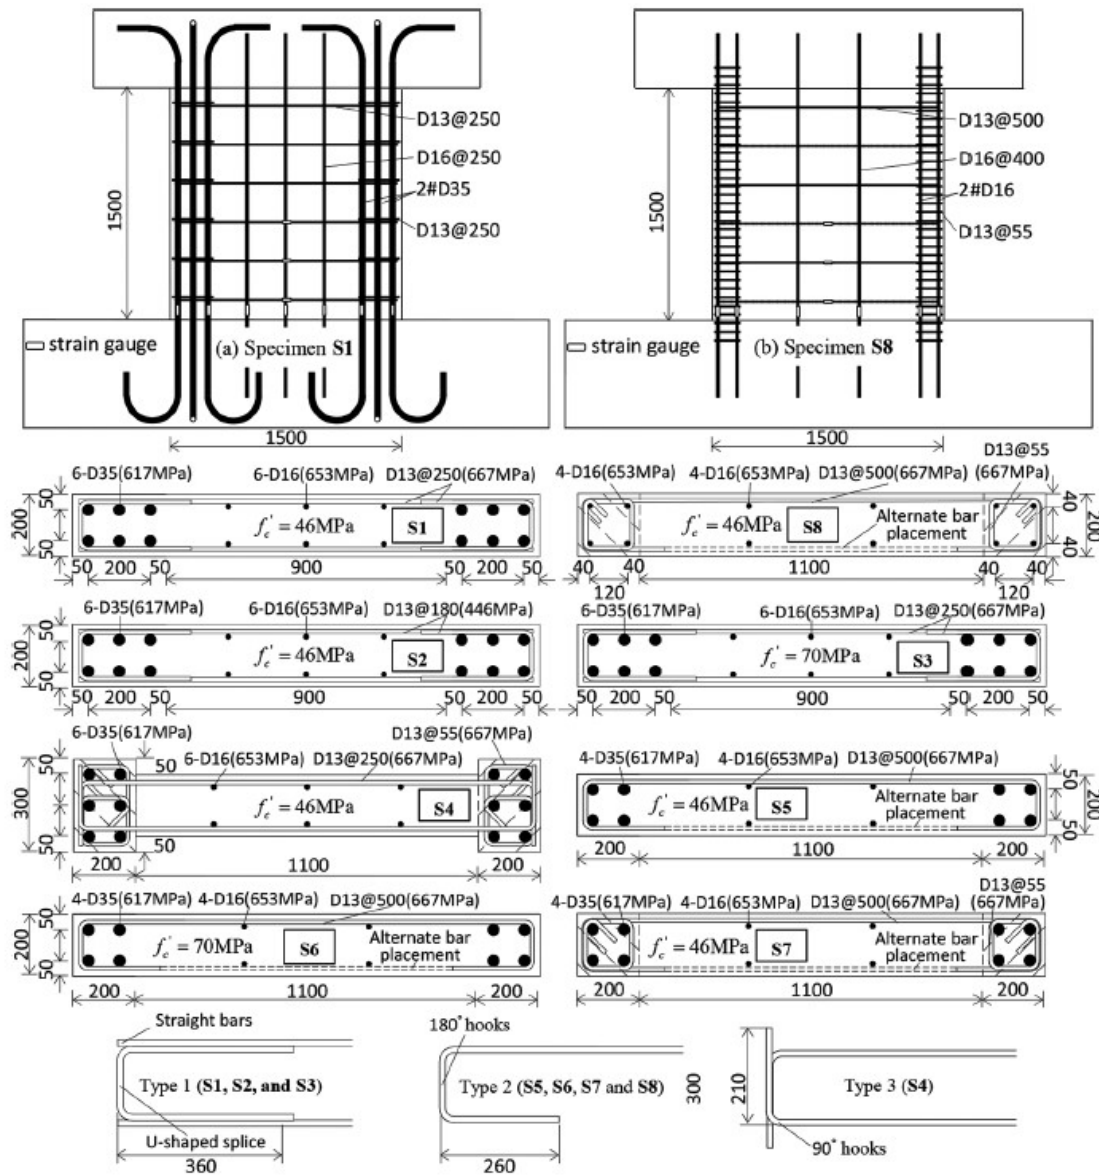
Dimensions and reinforcement details of walls tested by Park et al (2015)
